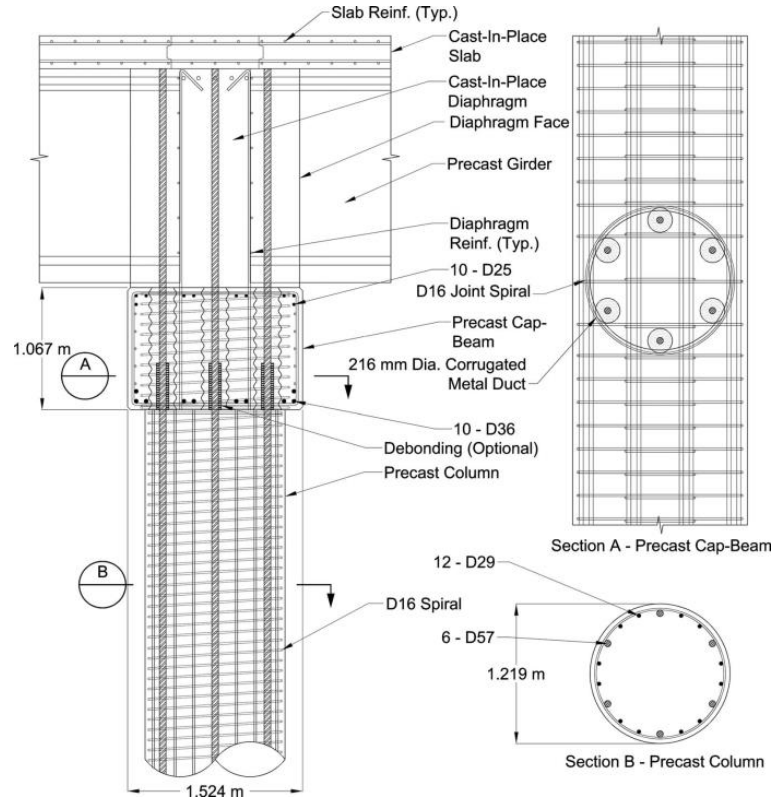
Large diameter rebar connections for bridge piers by Pang *et al.* (2010).
